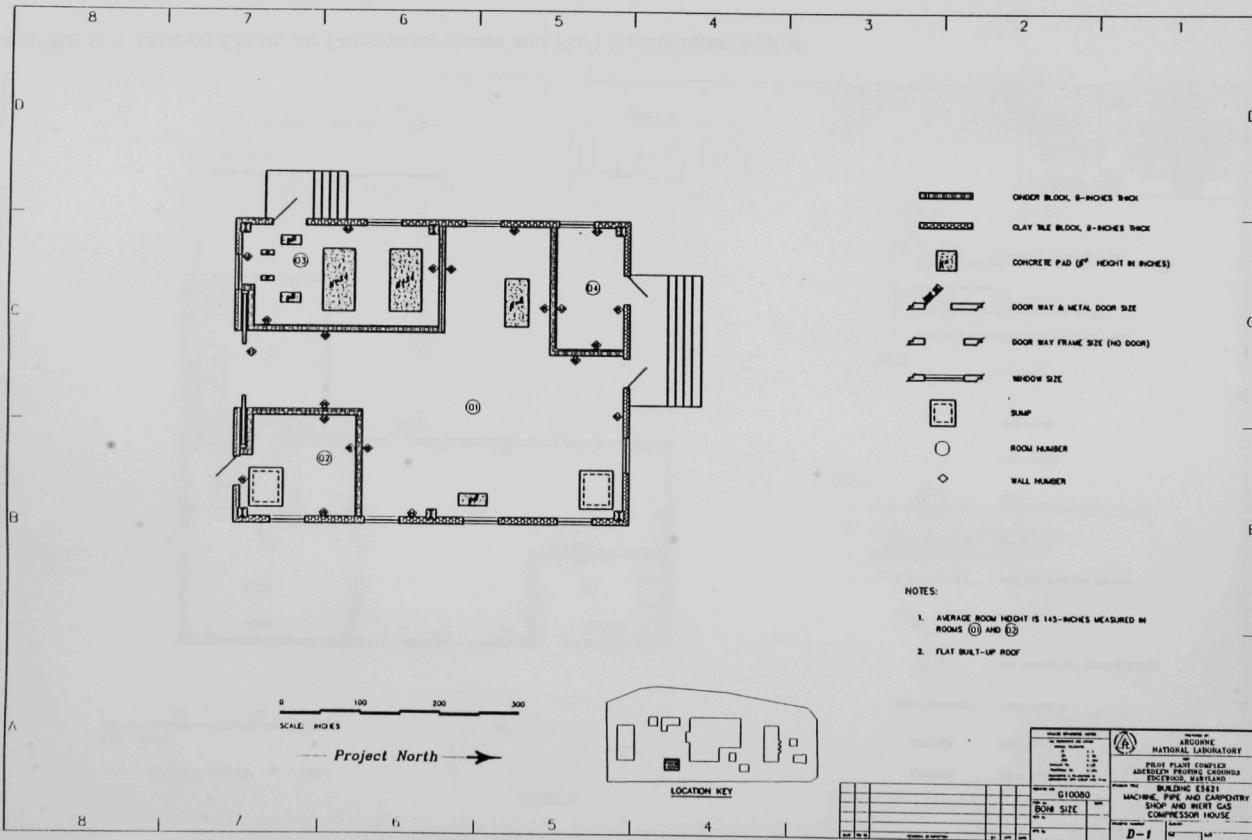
Building E5621, Machine, Pipe, and Carpentry Shop and Inert Gas Compressor House
